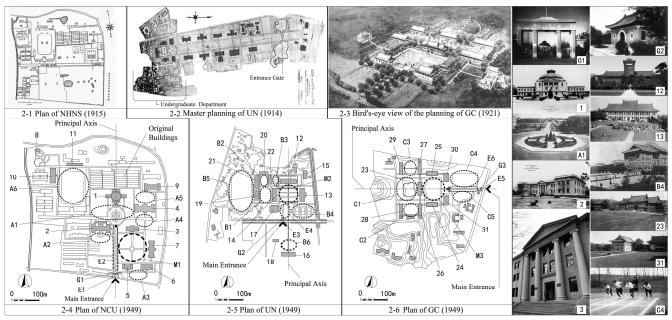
Plans, Planning Drawings and Pictures of Campuses¹⁹⁾
